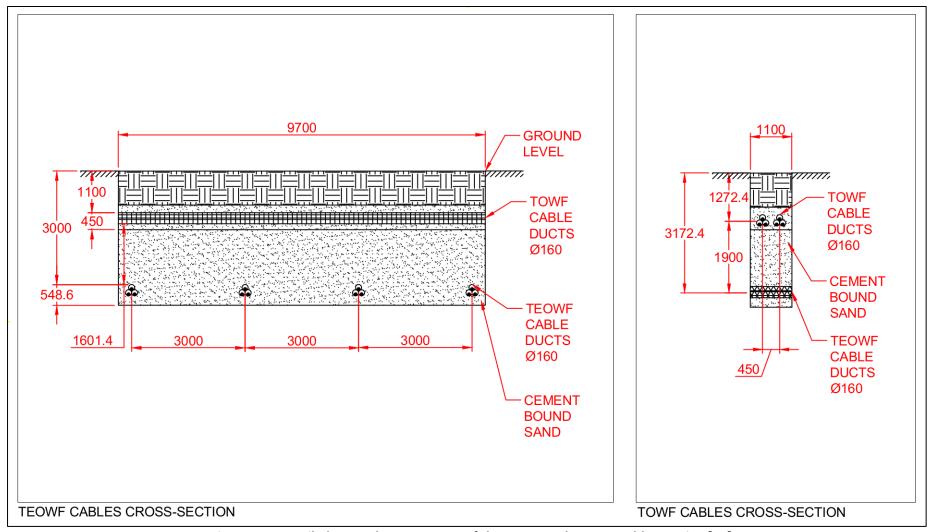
Detailed general arrangement of the TOWF and TEOWF cable crossing [18]
